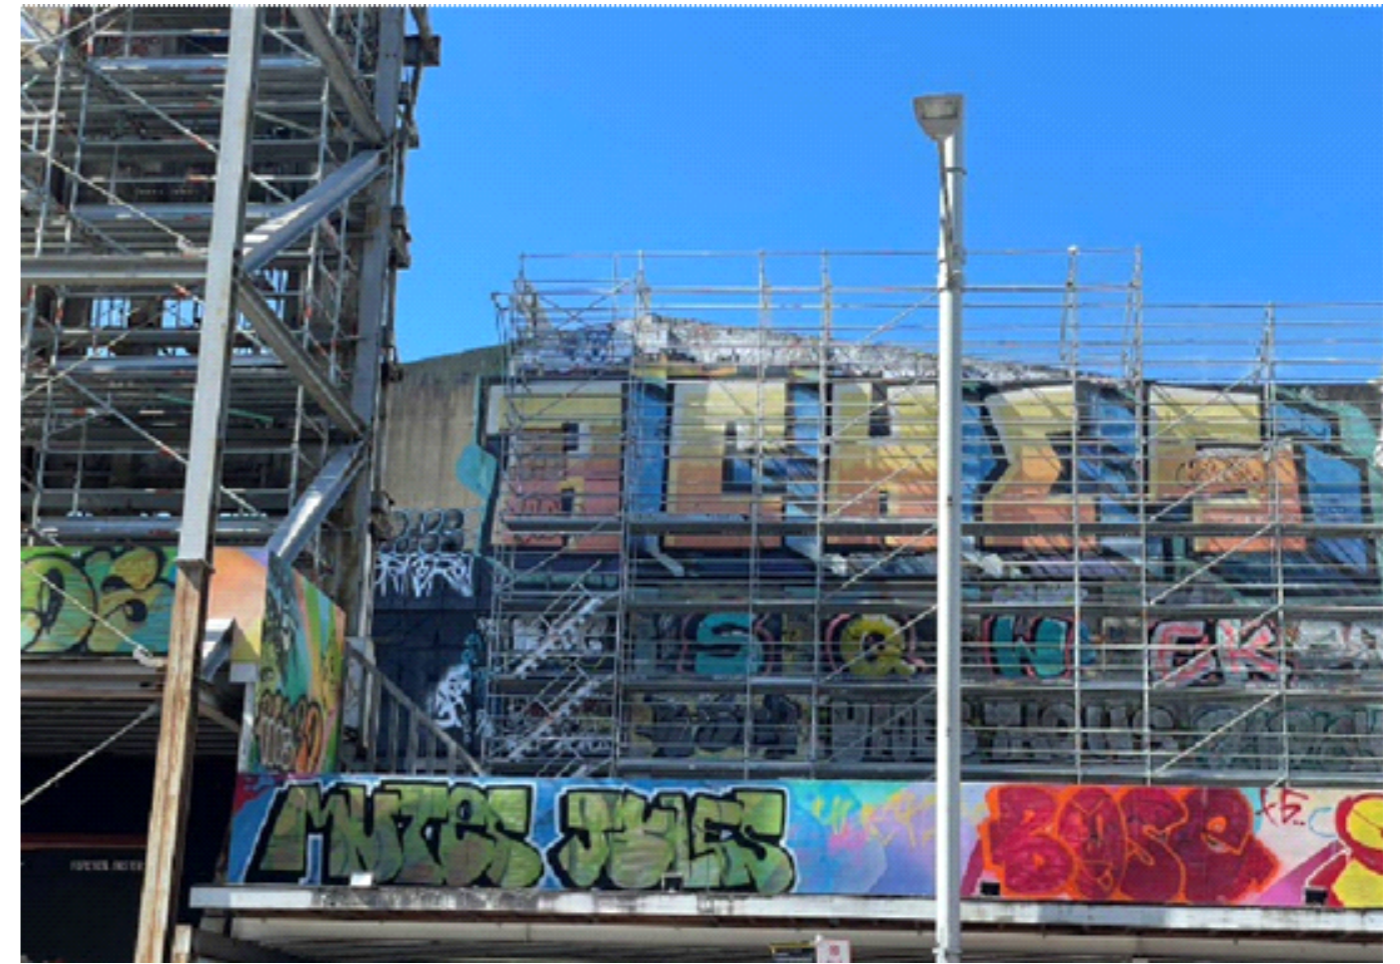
Photo of St James Theatre Site from Queens Street(2025).
